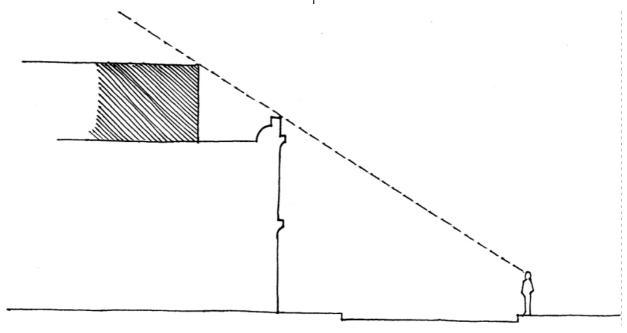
New additions should be setback to avoid being visible when viewed from the opposite side of the street from an average height of 1.7m.
